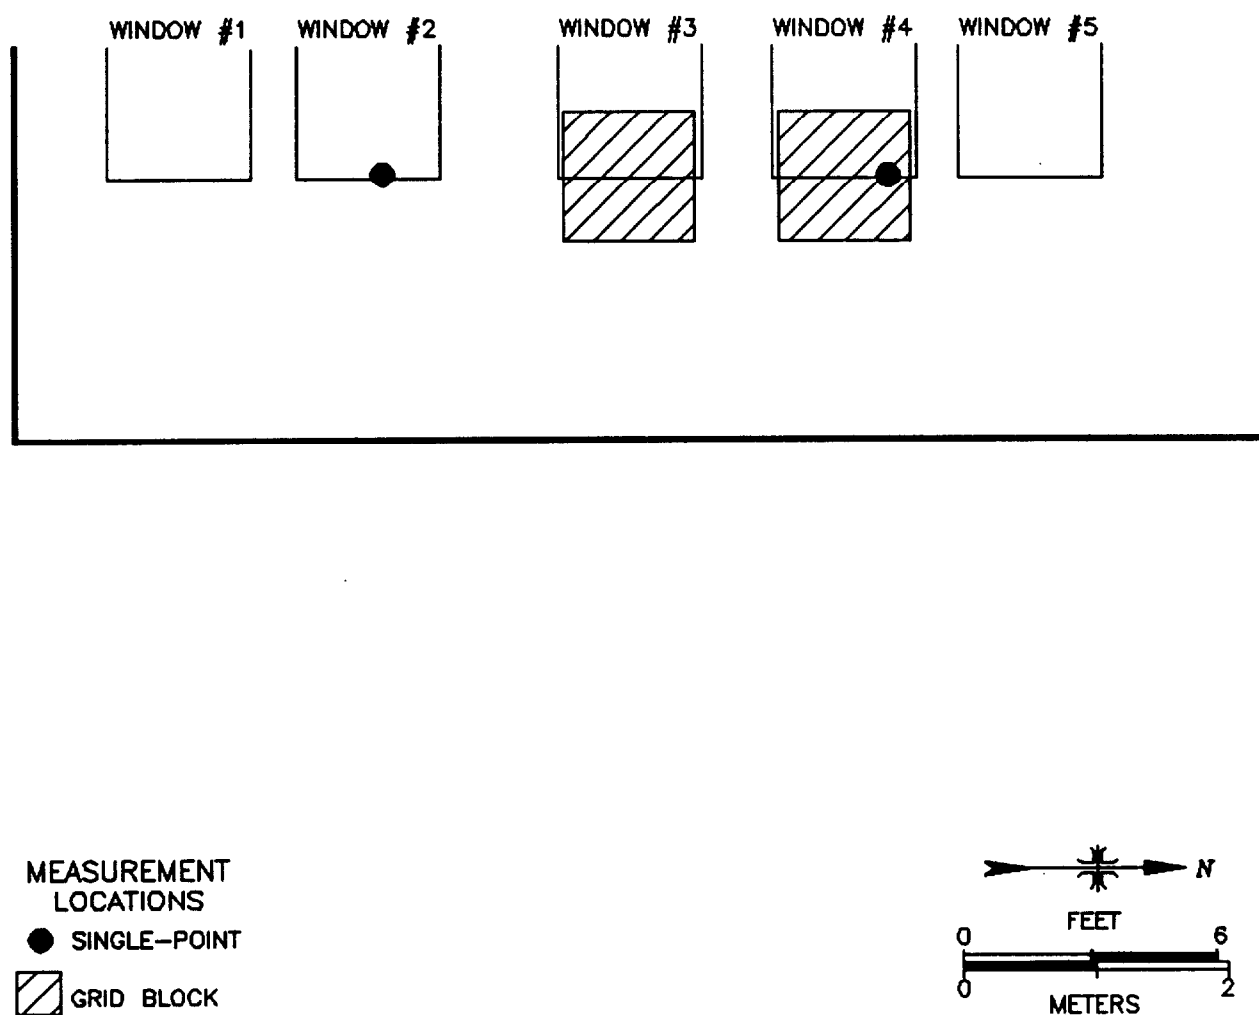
Building 23, Exterior East Wall, Outside Crusher Room First Floor – Measurement Locations
